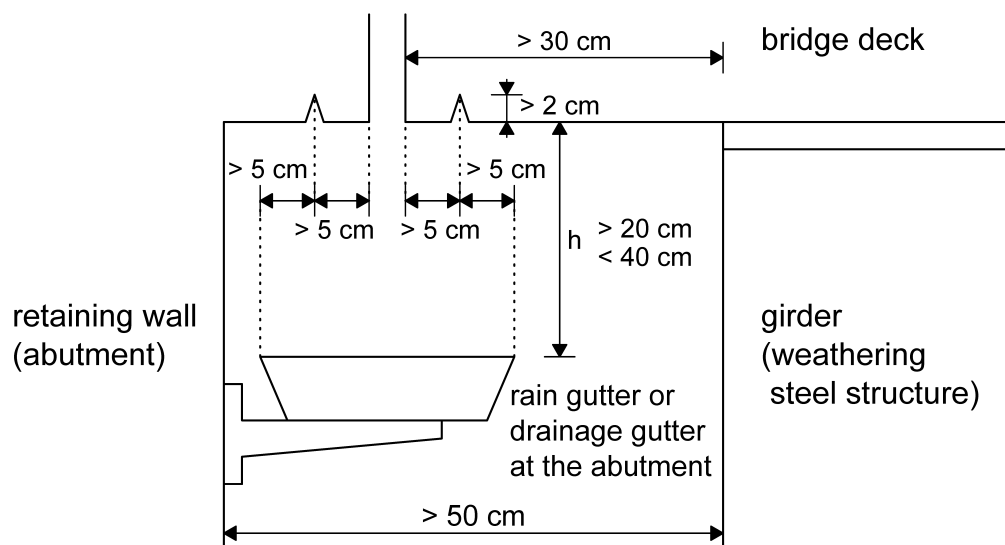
Distances between the end of the girder and the abutment [1]
